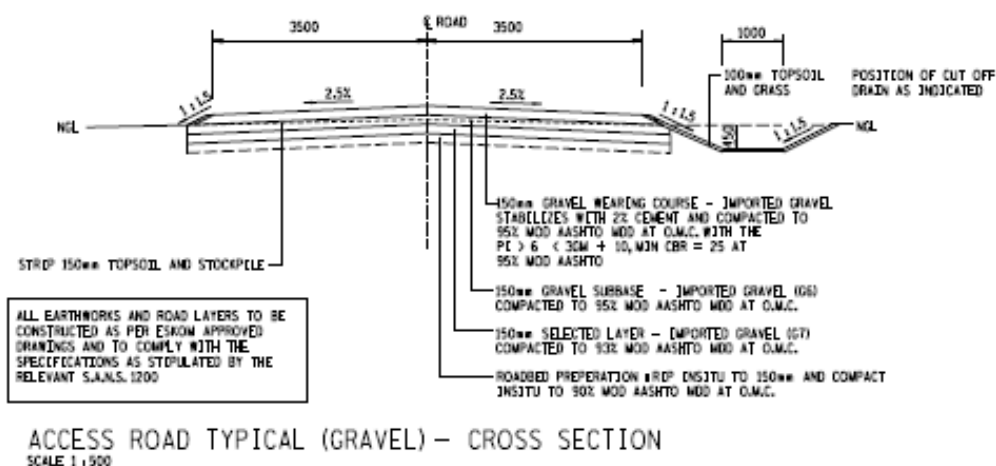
The minimum ESKOM Standard for access roads for extra heavy loads into ESKOM facilities (taken from ESKOM Typical Access Road Cross Section Drawing).
